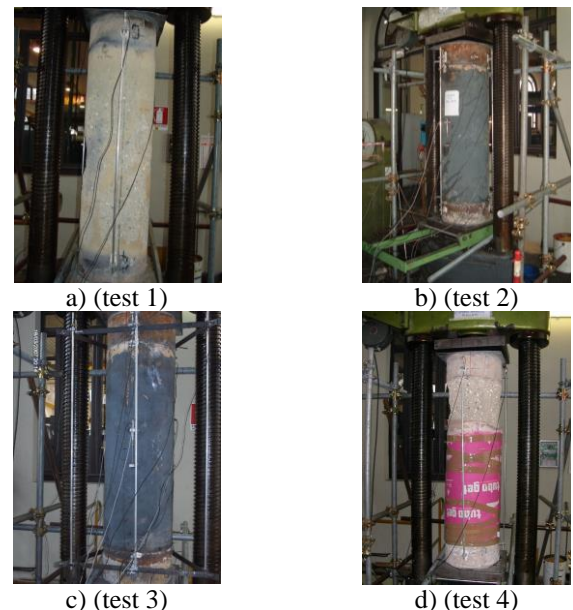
Compression tests at LPM of Politecnico di Milano: a) Specimen I; b) Specimen II; c) Specimen III; d) Specimen IV.
